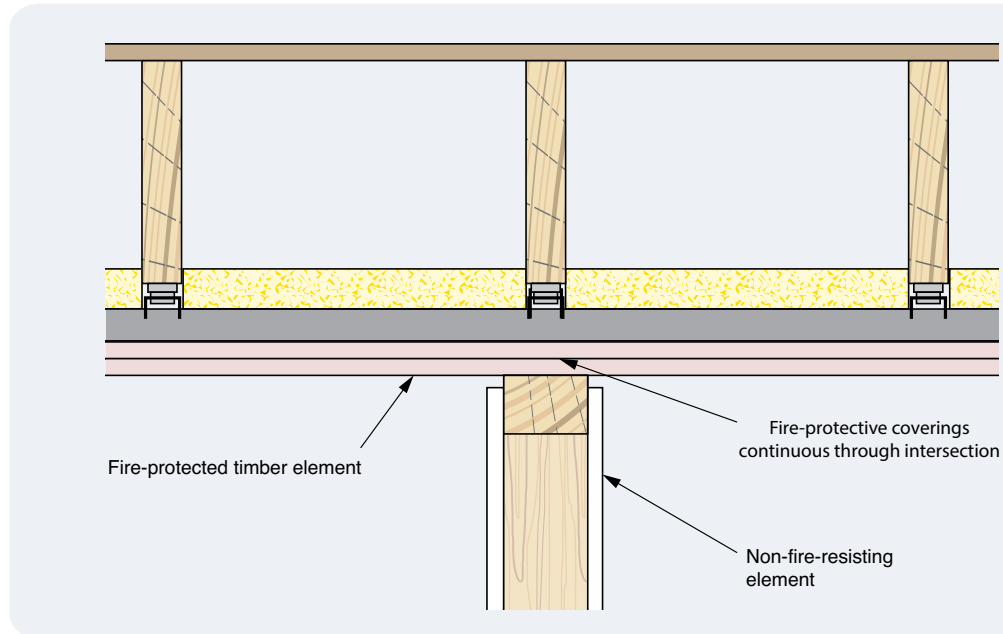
Junction of non-fire-resistant wall and fire-protected timber floor.
